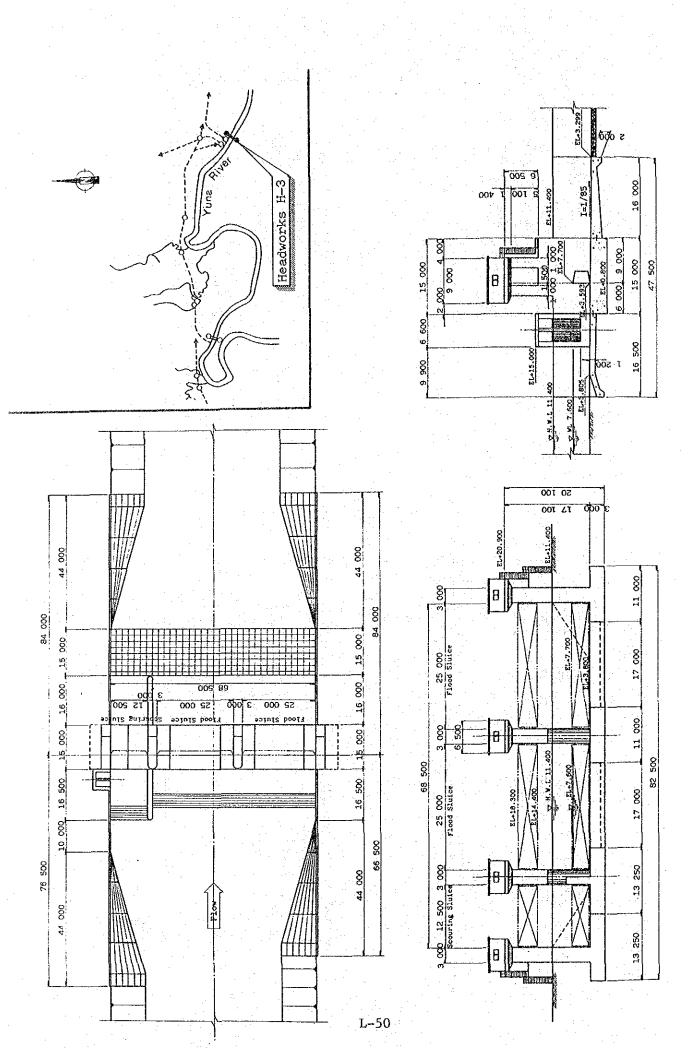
GENERAL PLAN OF PROPOSAL H-3
